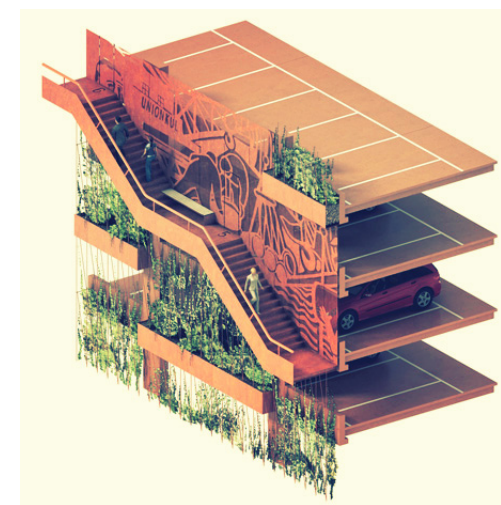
Sectional axonometric view of facade with outside staircase
